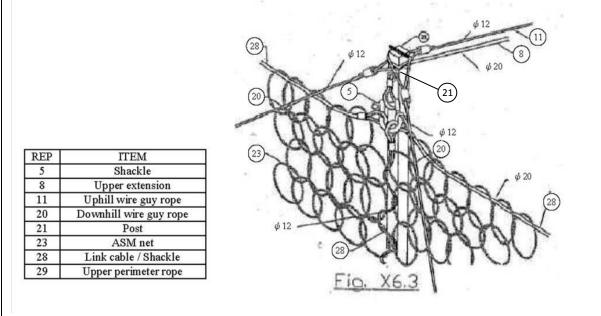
Details of the Arrangement at the Upper End of a Steel Post (Abstract of Fig. X6.3 from Drawing No. P-010/AS/02)
